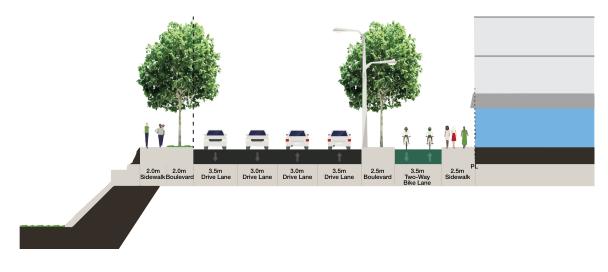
Conceptual cross section for Ravine Way (20 metres)
